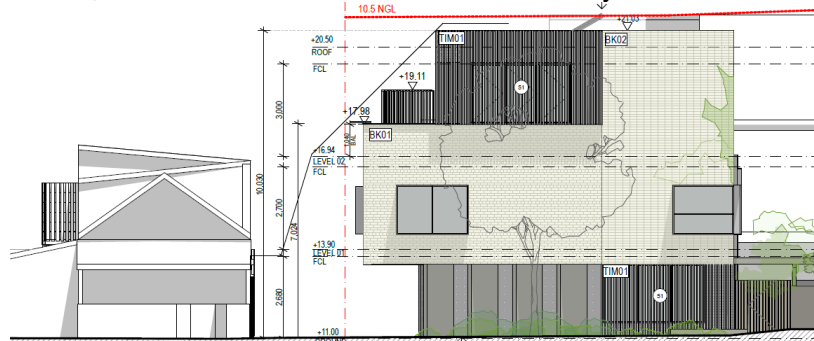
West Elevation of Dwelling TH01 showing setback link associated with the Standard when measured from the northern edge of Barrow Place (applicant submission, December 2020)
